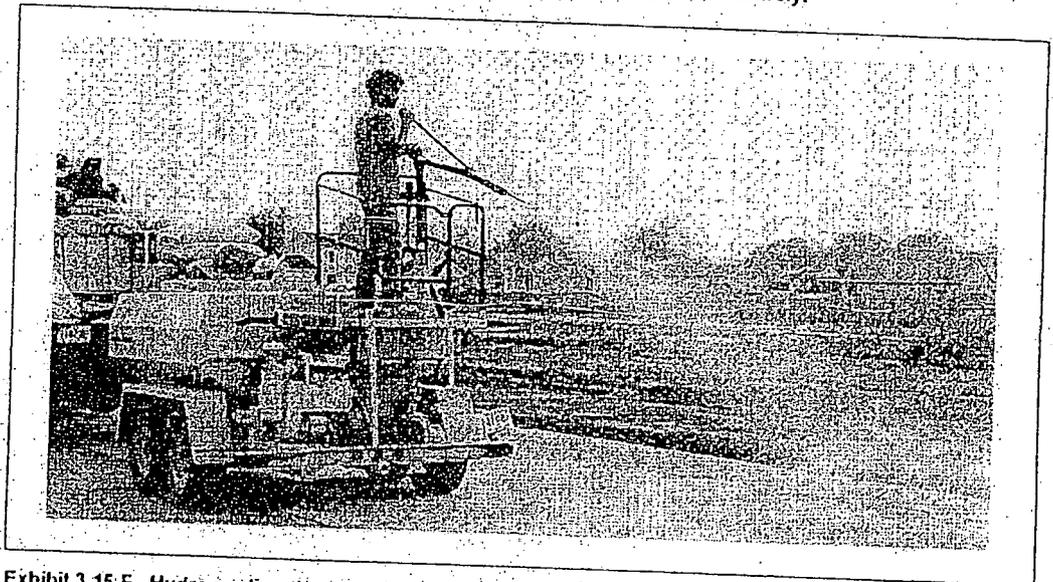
F. Hydroseeding the roadside in a new subdivision.
